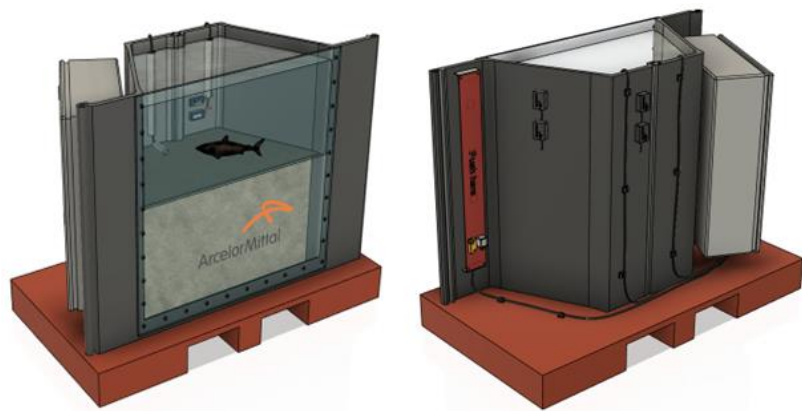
b: the 3D model of a demonstrator of a sheet pile equipped with sensors.
